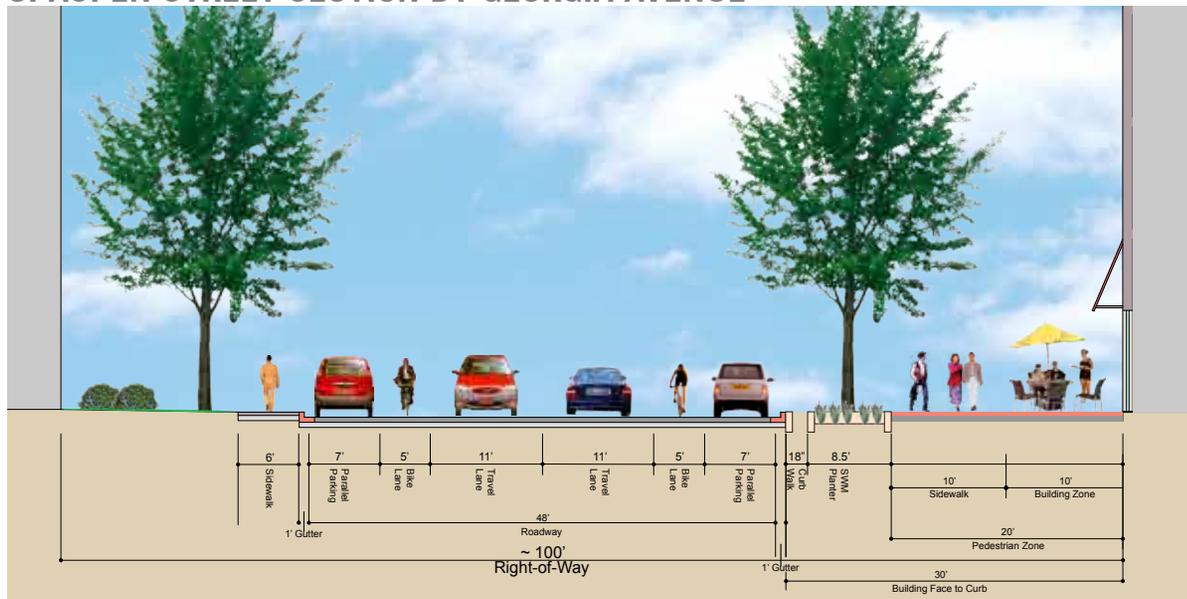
Aspen Street Section. Source: Perkins+Will.
